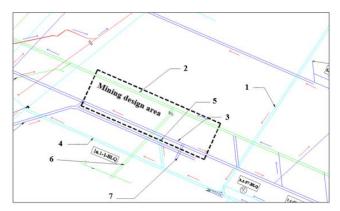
Plan of the preparation tunnels in the design area: 1 – main haulage crosscut at +30 level to the TQ1.1 ore body; 2 – ventilation level at +110 of the TQ1.1 ore body; 3 – haulage level at +70 of the TQ1.1 ore body; 4 – haulage level at +30 of the TQ1.1 ore body; 5 – central haulage brake incline; 6 – crosscut at +110 level from the TQ1.1 to the TQ1a.1 ore body; 7 – crosscut at +70 level from the TQ1.1 to the TQ1a.1 ore body
